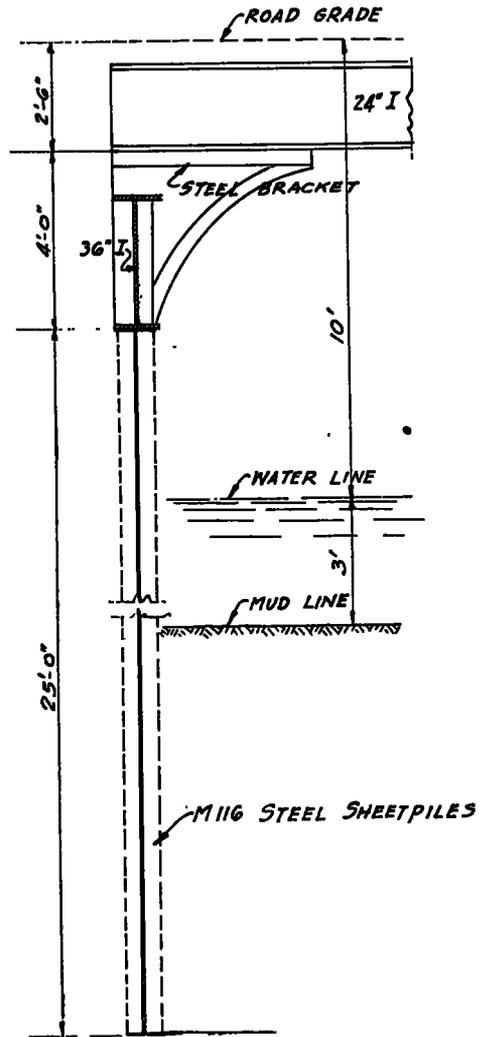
Braced Piling. From Michigan State Highway Dept. Design of Grayling Bridge
